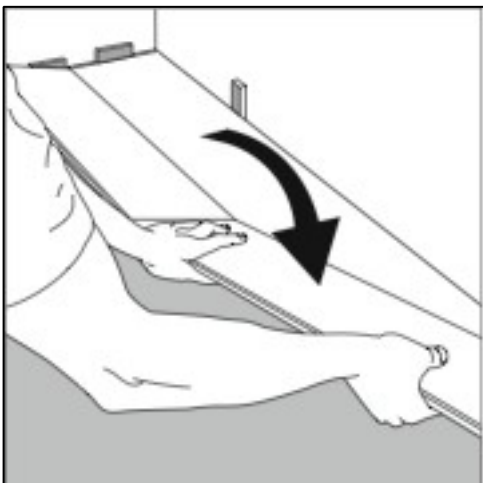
Second plank second row. Place the short end of the plank at an angle against the previous installed plank and fold down to engage the short ends. See Fig. 2 above.
